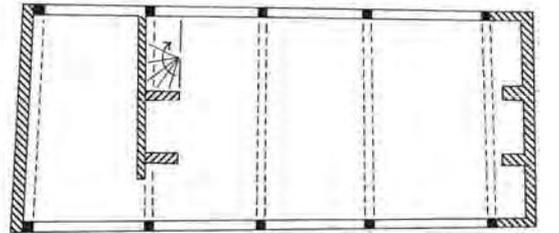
Site 281N, Area B. Sketch reconstructions of buildings
